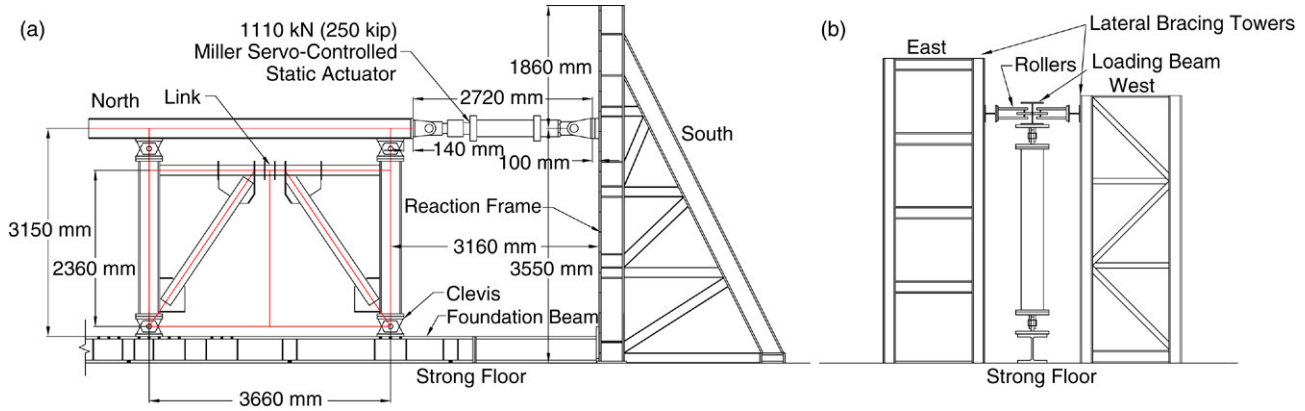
Proof-of-concept test setup (a) elevation (b) plan.
